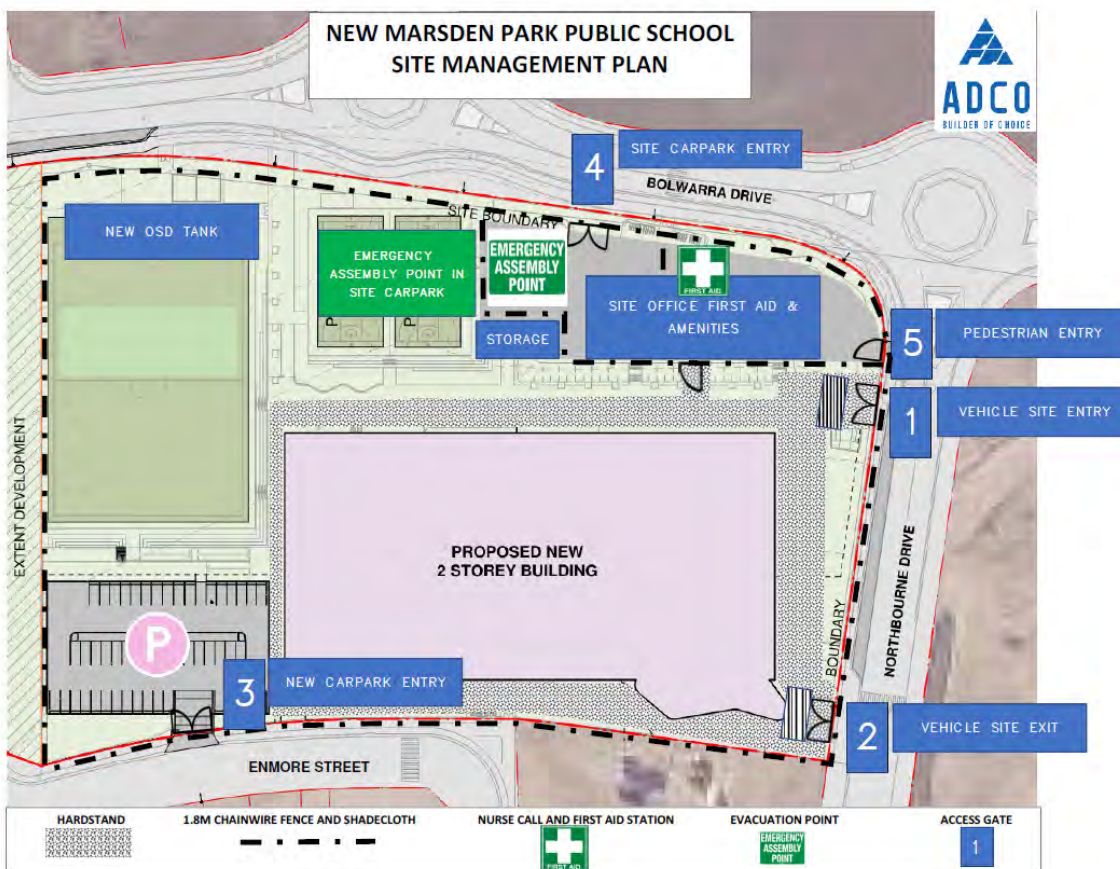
Site Mangement plan during construction of the temporary school, ADCO Constructions.
